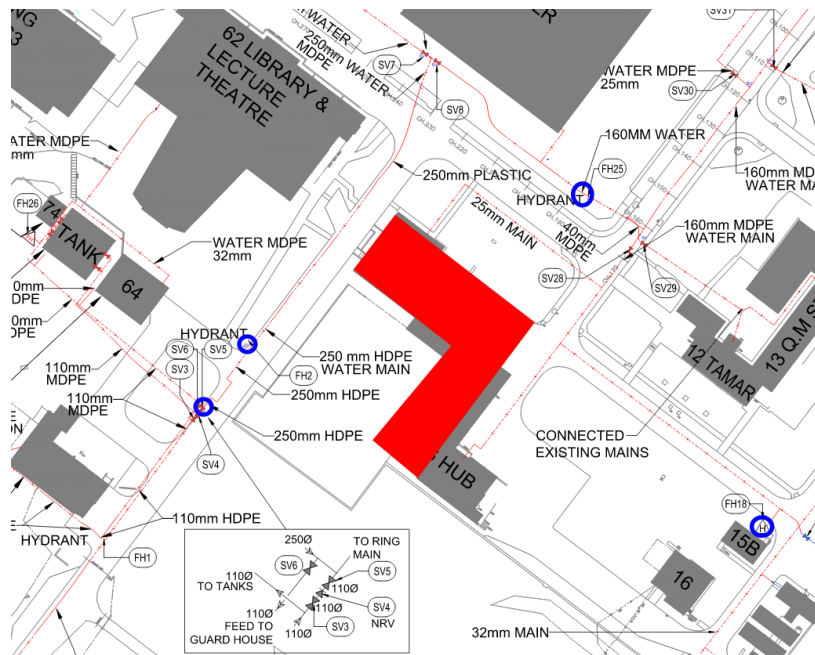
Hydrant locations (Blue) around Proposed Building (red)
